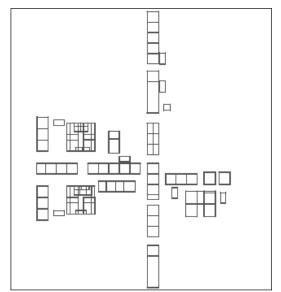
Site Layout for Installation of 68 Modules of Practical Case Study
